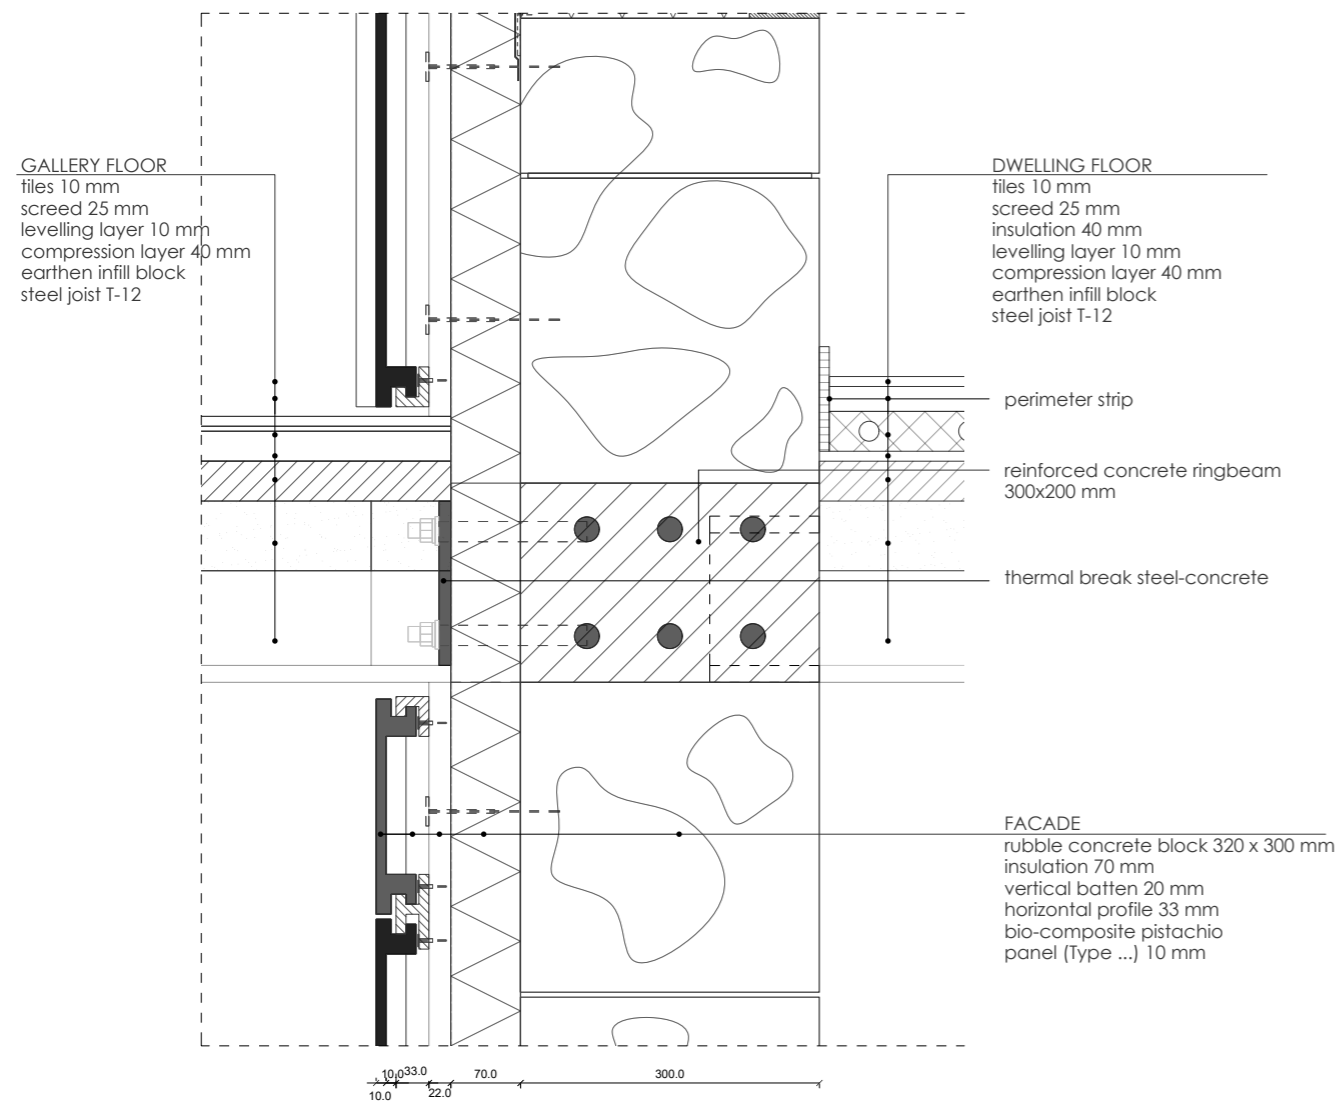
PISTACHIO BIO-COMPOSITE FACADE VERTICAL
